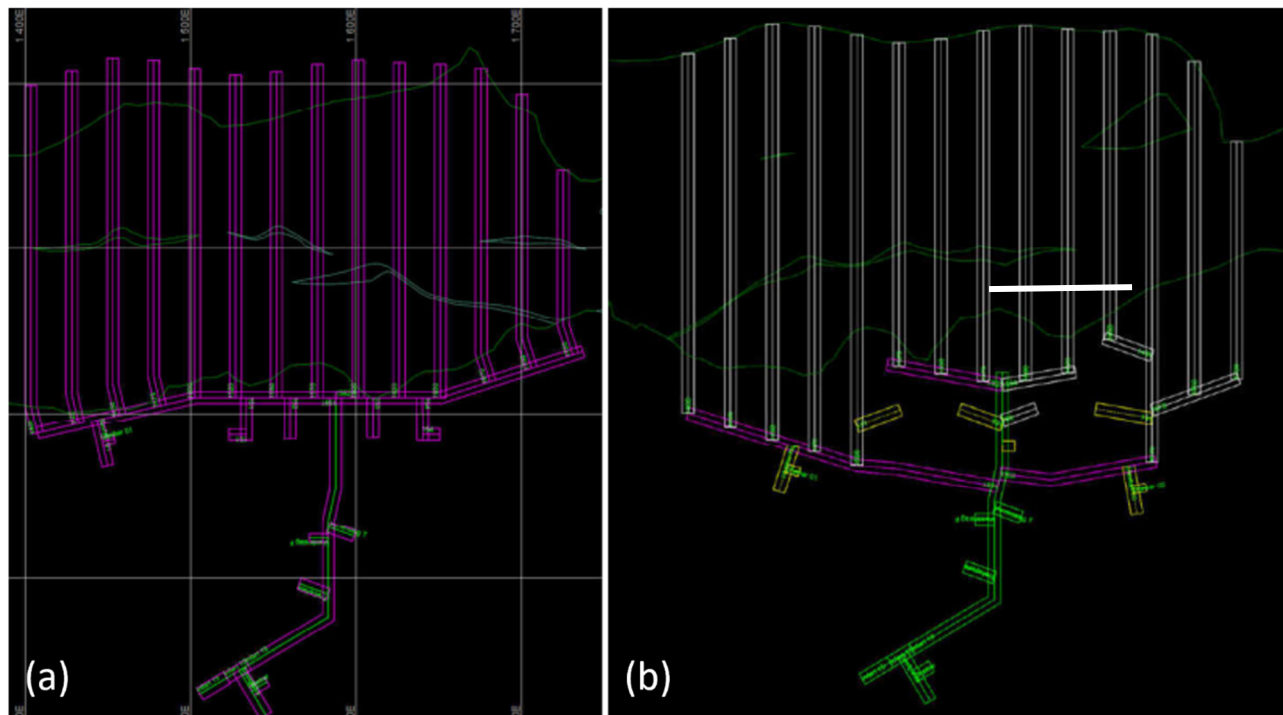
(a): Kiruna standard layout plan, Block 15/1194. (b) Kiruna hybrid layout plan. Source: Theresa Lundgren, LKAB. Ore body outline in green.
